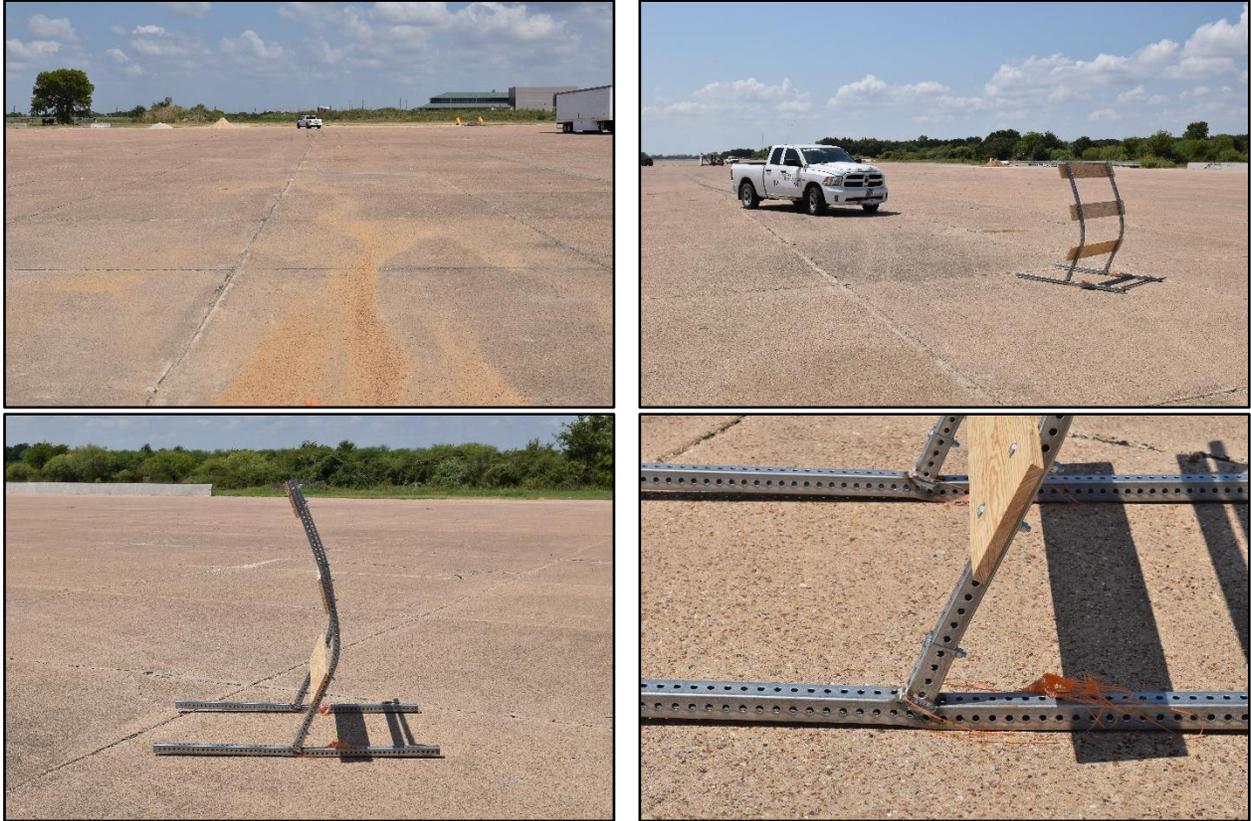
Type III Barricade after Test No. 469469-12-03.
